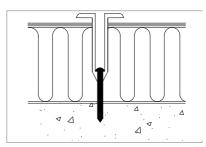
Fastener installed too loose - Screw spike or tube is too long - Hole is not deep enough
